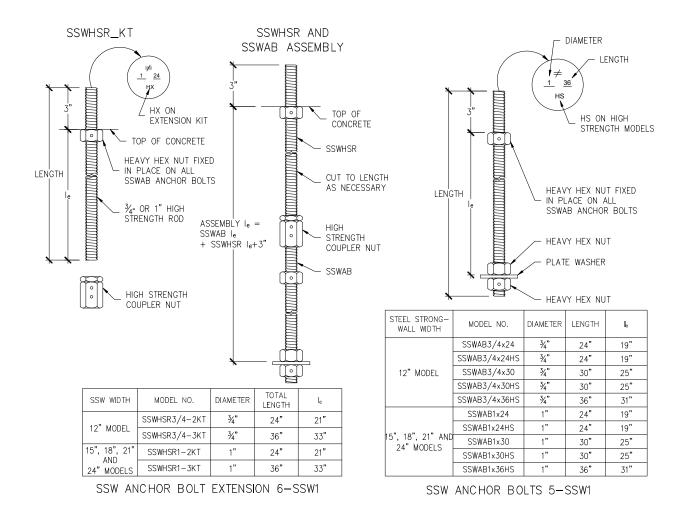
STEEL STRONG-WALL ANCHORAGE DETAILS (Continued) (5,6/SSW1, 6/SSW1.1)
